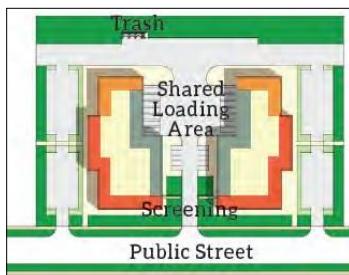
Option No. 3: Permitted Site Layout (building side is facing the public roadway, with shared service court).
